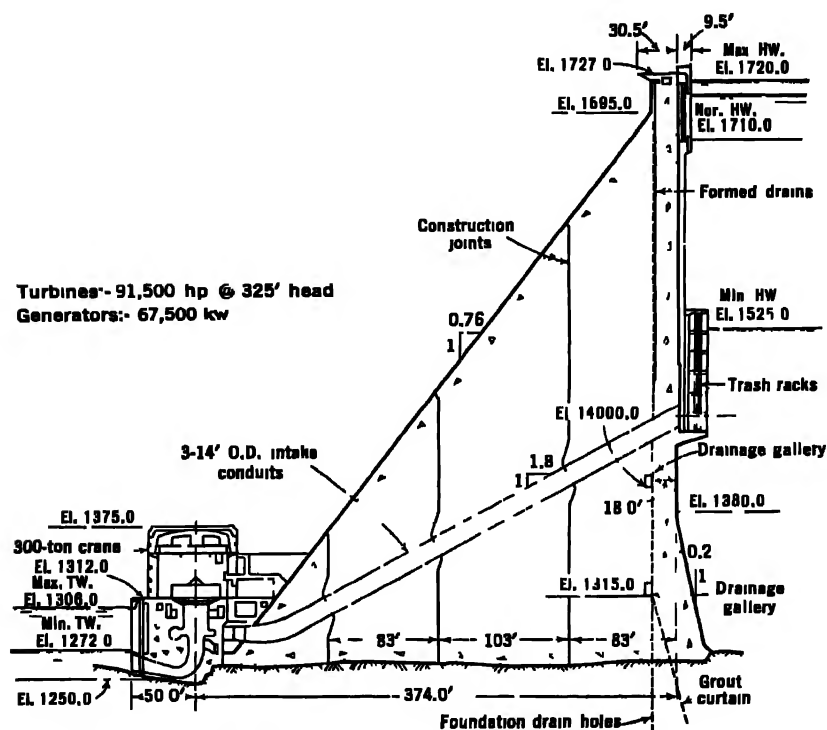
Section through Fontana Dam and powerhouse (*Eng News-Rec*, Nov 16, 1914)
